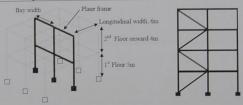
Frame Layout (Left) and Typical Bracing System Against Wind Load (Right)
